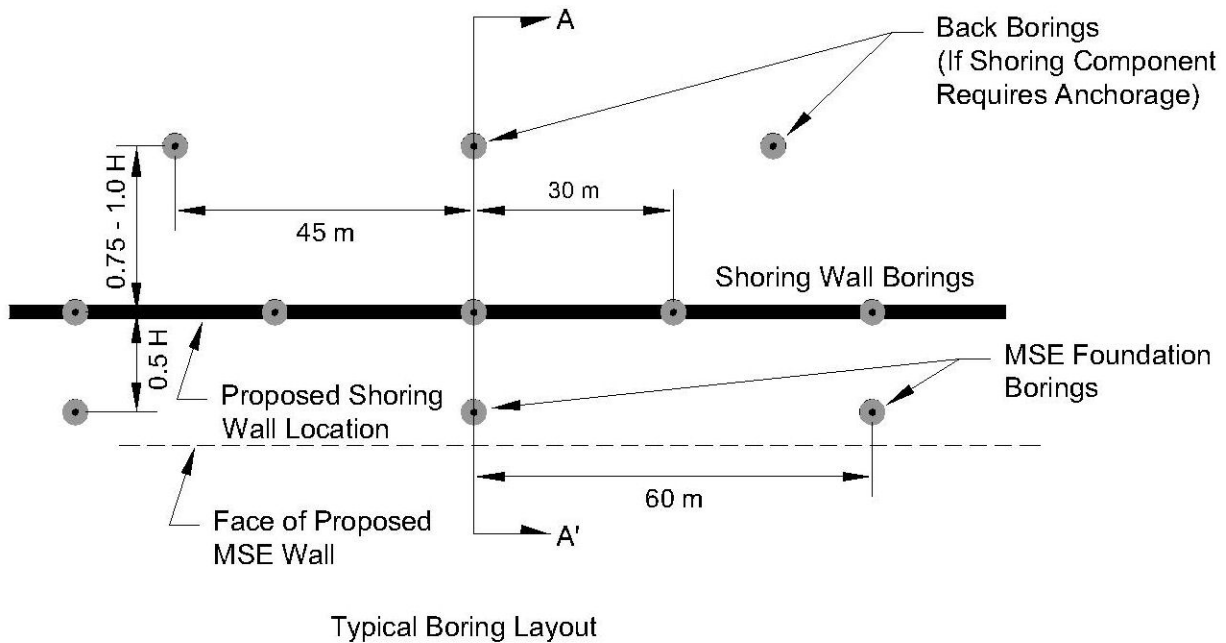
Diagram. Ideal boring layout for SMSE wall system design.
